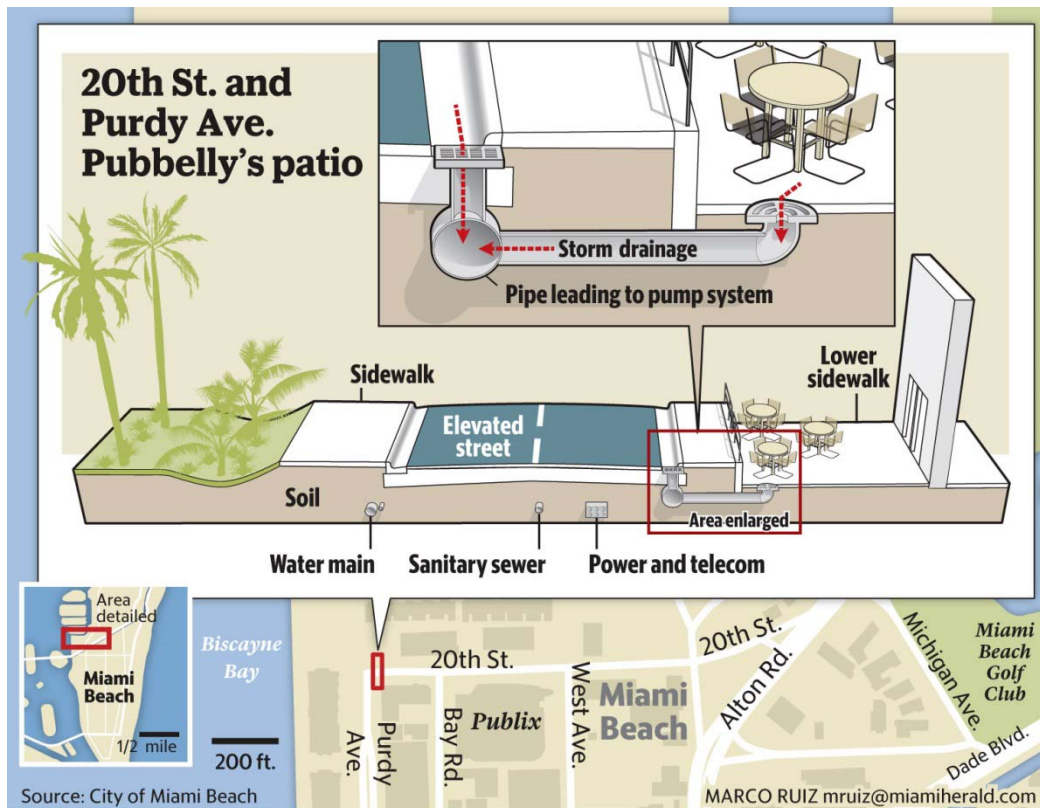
Elevated roadway at 20th Street and Purdy Avenue. The patio (private property) is 2 feet lower than the street. Floor drains in the patio convey water into the roadway drainage system, which routes water to the pump station.
